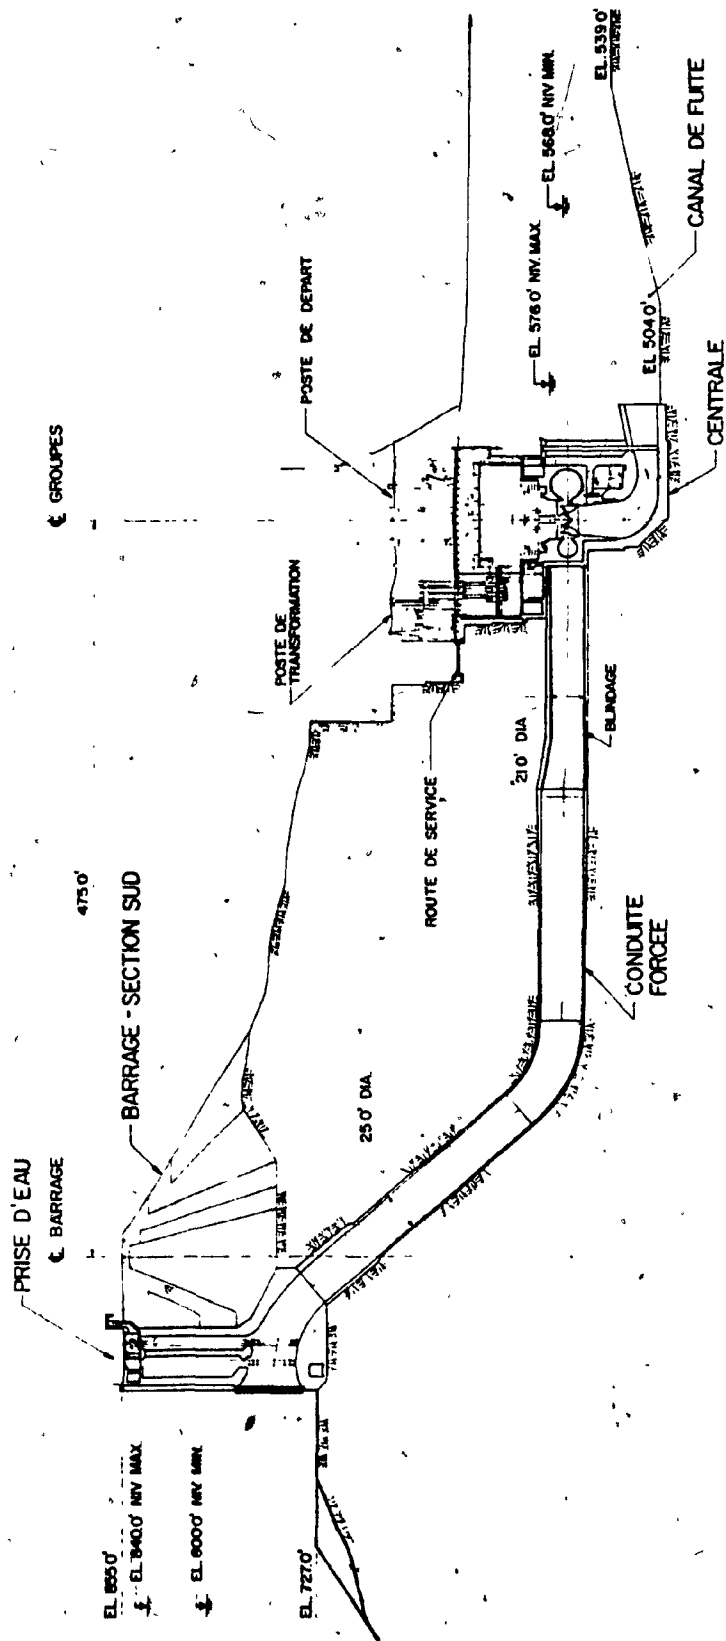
Typical Lay-Out of LG-3 main dam and powerhouse.
